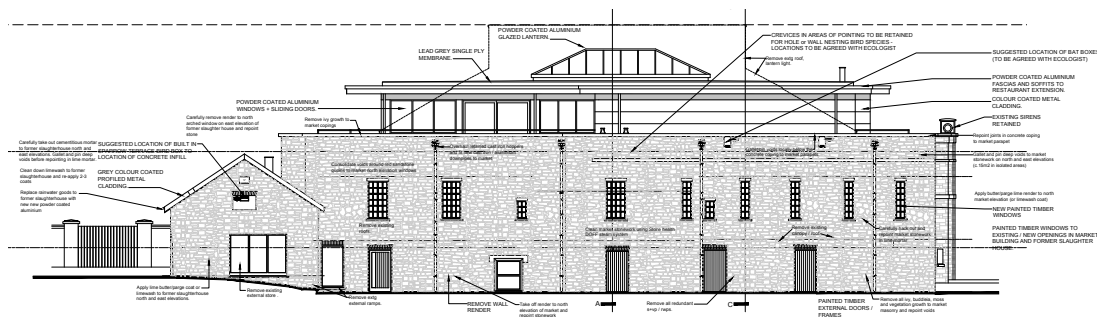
above: Consented north east elevation – source Pembroke Design Ltd
